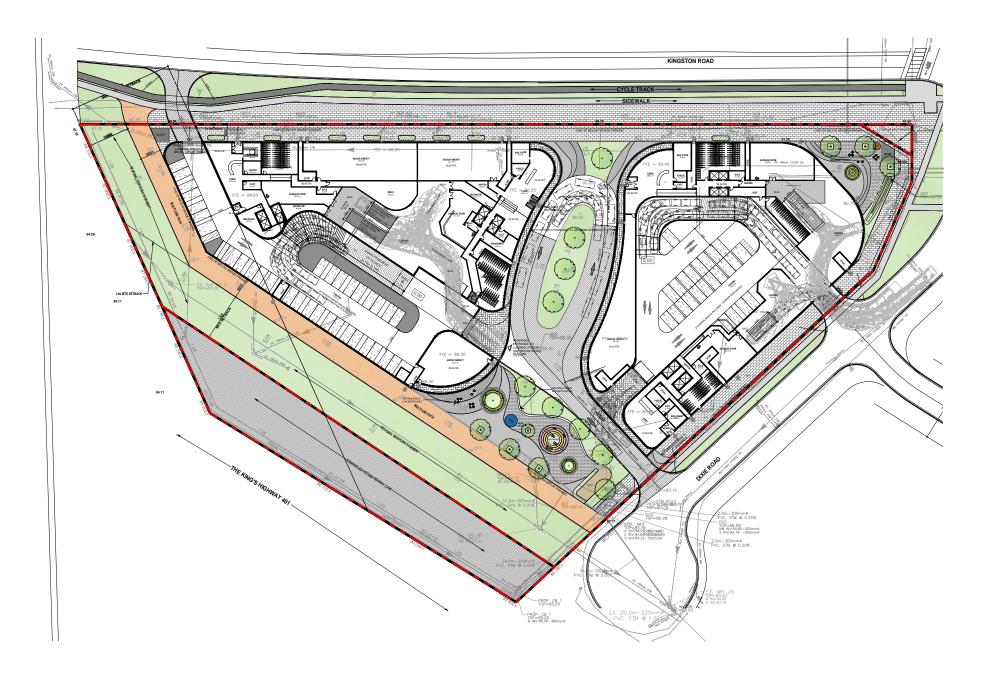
Landscape Plan (MHBC planning, urban design & landscape architecture)
